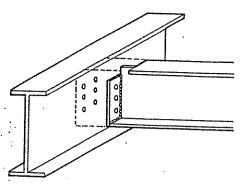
Schematic arrangement for a beam-to-beam connection using a welded end plate.
